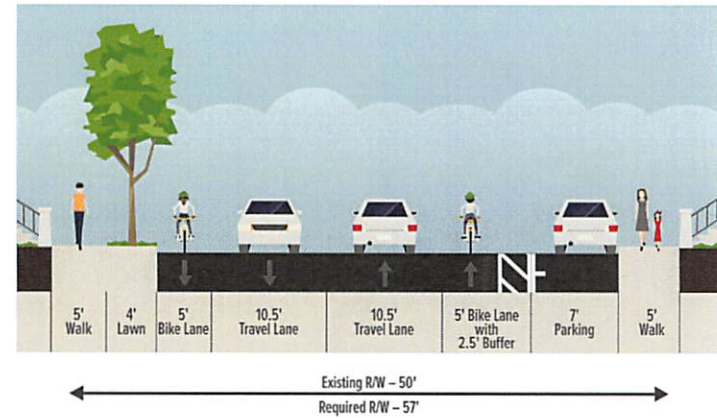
S.R. 55 TO W BROADWAY STREET – PARKING
